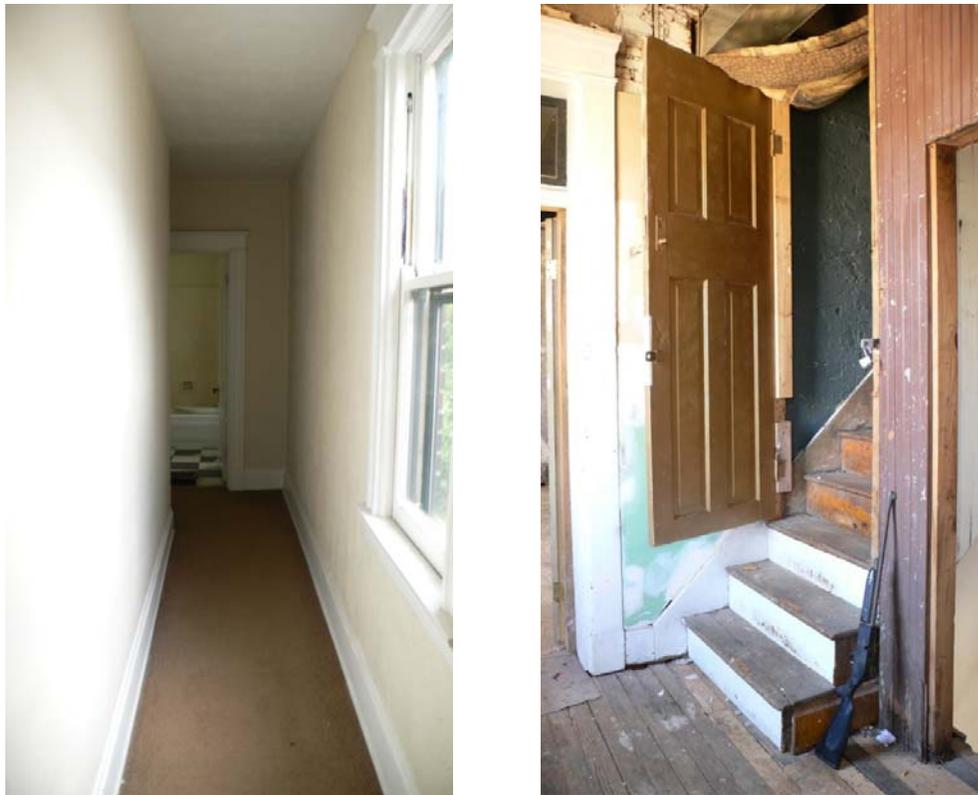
Left: Upstairs hallway, 529 West 12th Street. Right: Stairway opening to third floor, 1206 Banklick Street.
